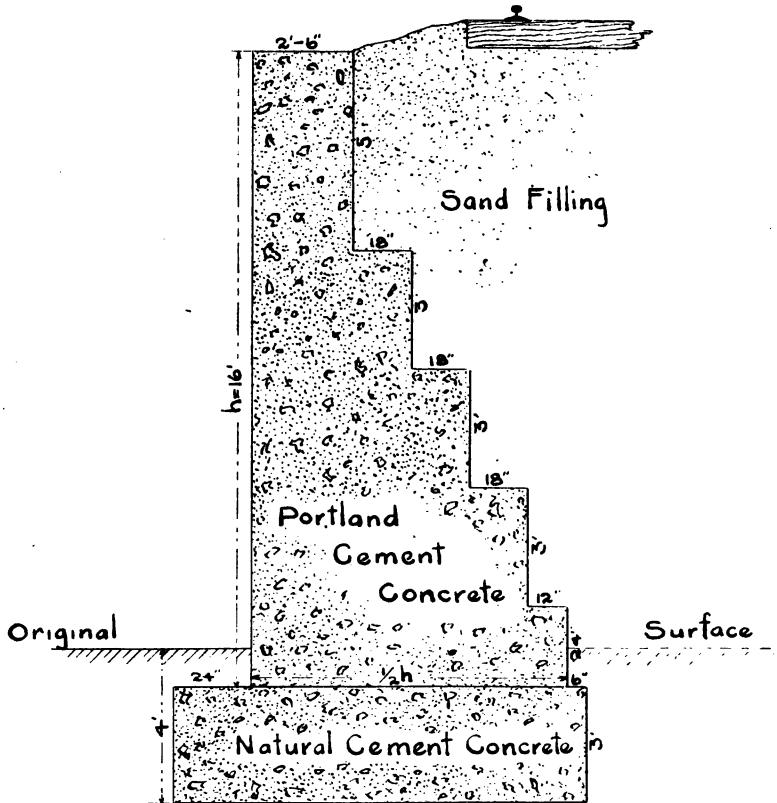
Section of Retaining Wall C. R. I. and P. R. R. Showing Maximum Section.
